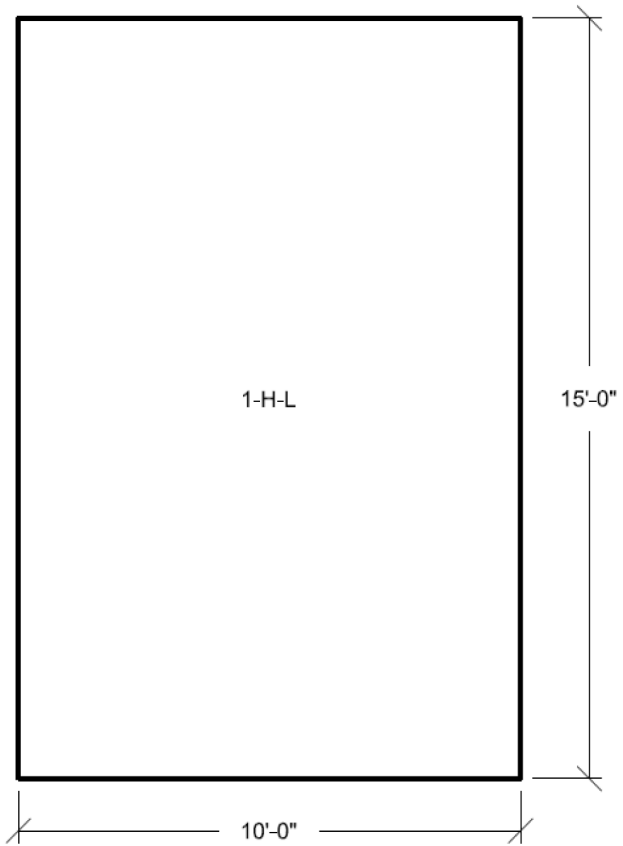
H.6-206 DGFOV Wall 16 Looking From Outside
